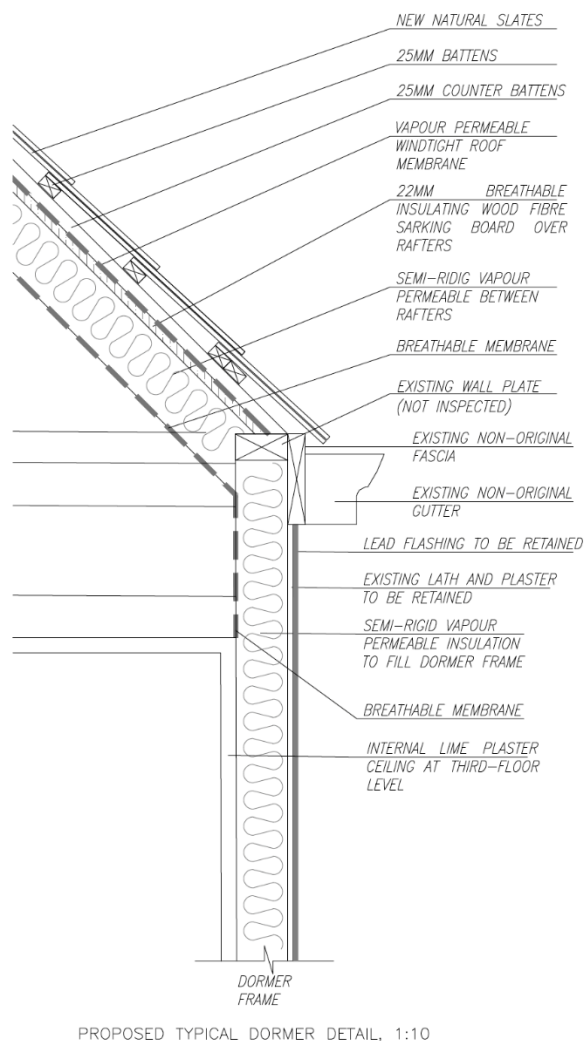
Proposed method to insulate the roof and dormers if the existing roofing materials are due to be replaced.
